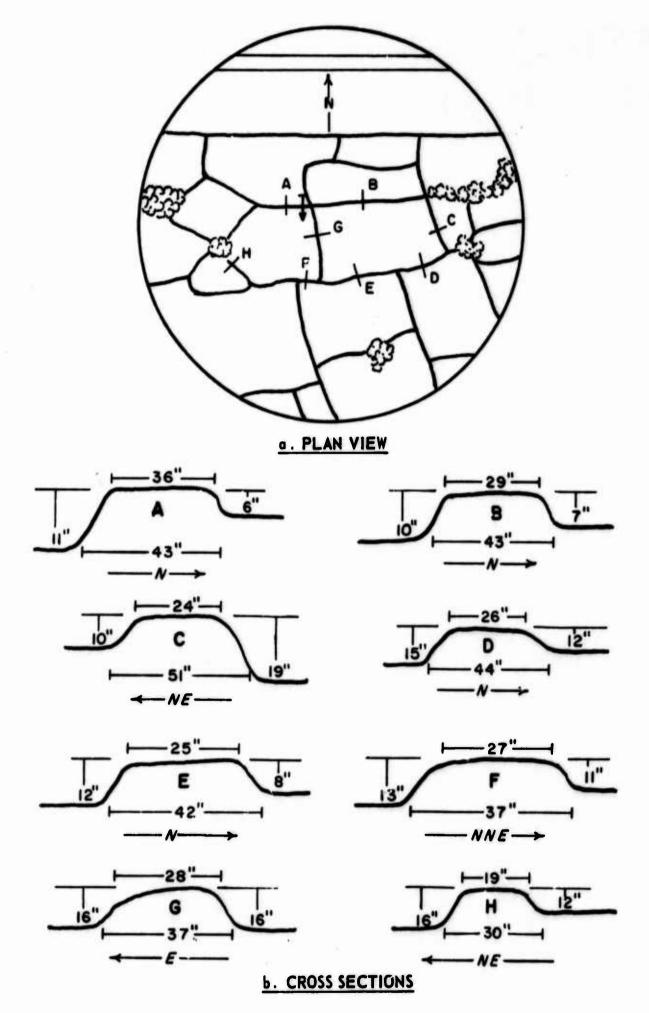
Paddies with random arrangement--dike plan view and cross sections at site SG-114 (September 1964)
